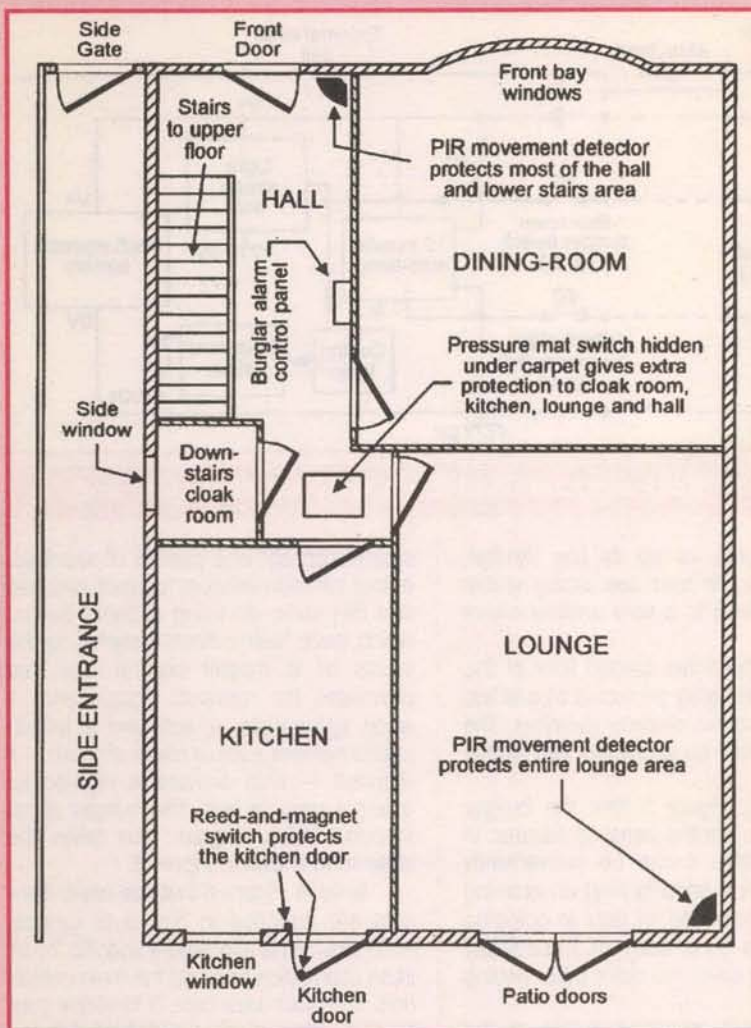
Ground floor plan of a semi-detached house, showing suitable positions for anti-burglar defenses.
